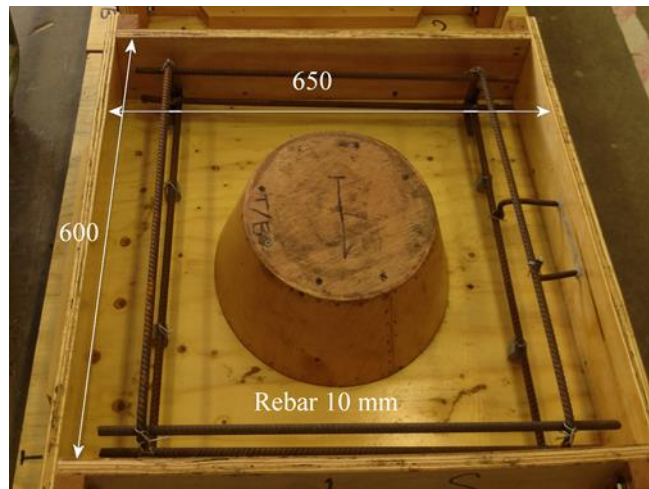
Reinforcement used in FBSC Test 1 and 2
